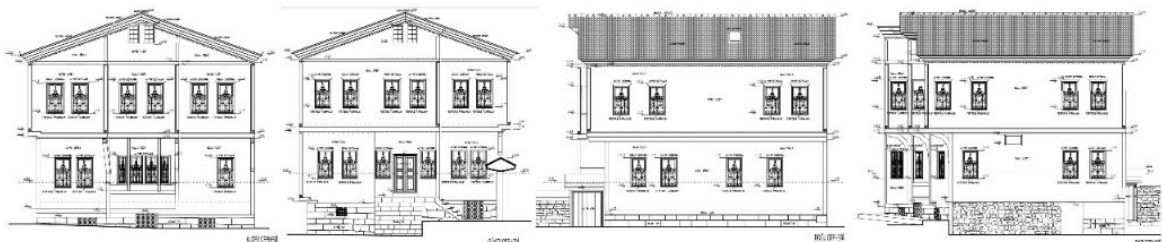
Facade views of the mansion (Source: ORAN Development Agency, Photo archive)
